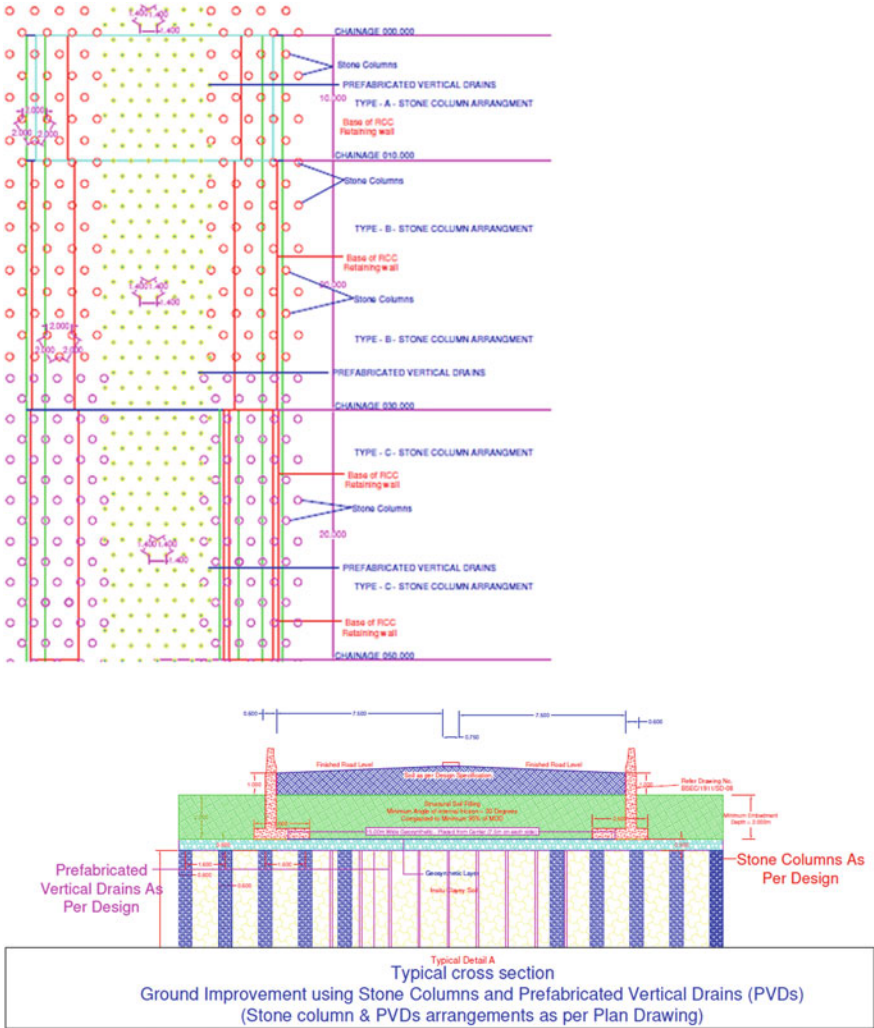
Plan and section showing stone columns below retaining walls and PVDs below earthfill
